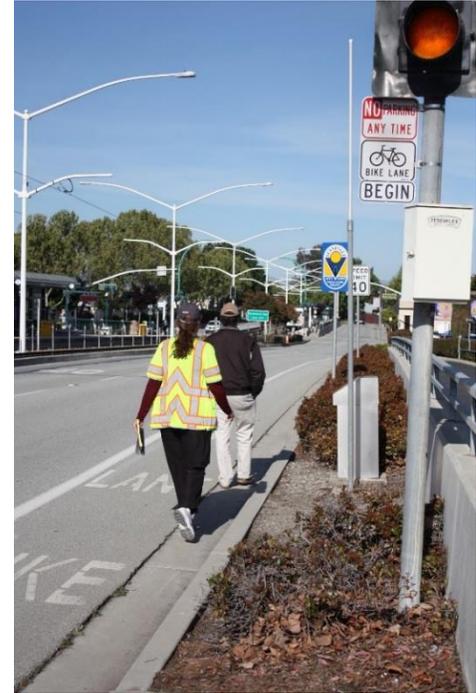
Missing sidewalk along Tasman Drive, west of Calabazas Creek Bridge
